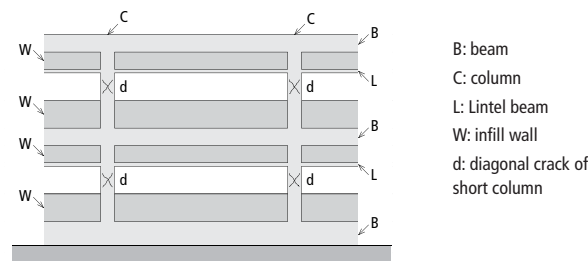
Shear failure of short columns (Arya et al., 2014, p. 144)
